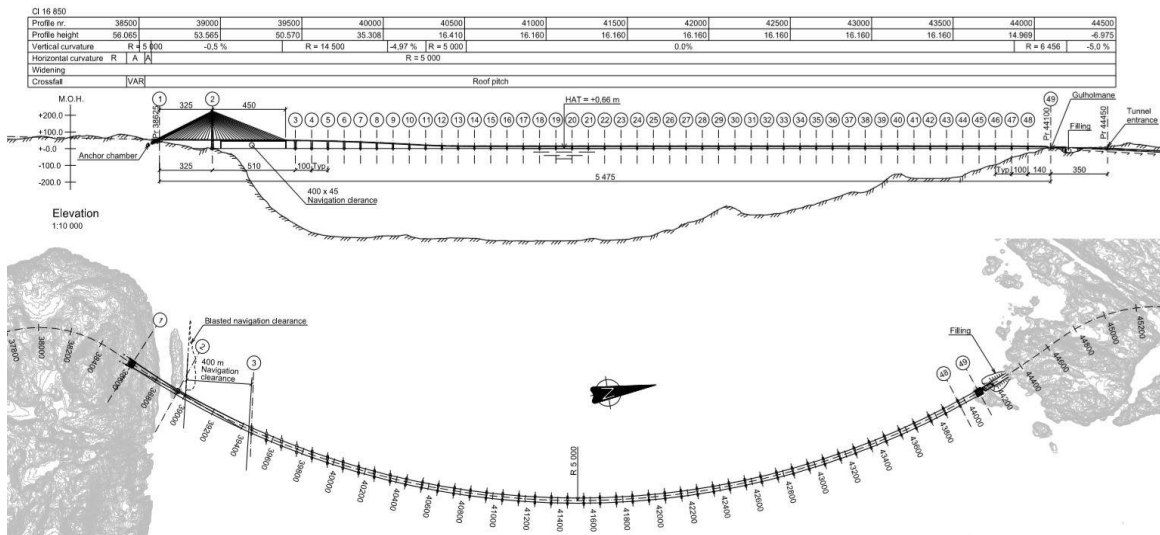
Orientation of the bridge in elevation and plan view (Norconsult AS, 2017a)
